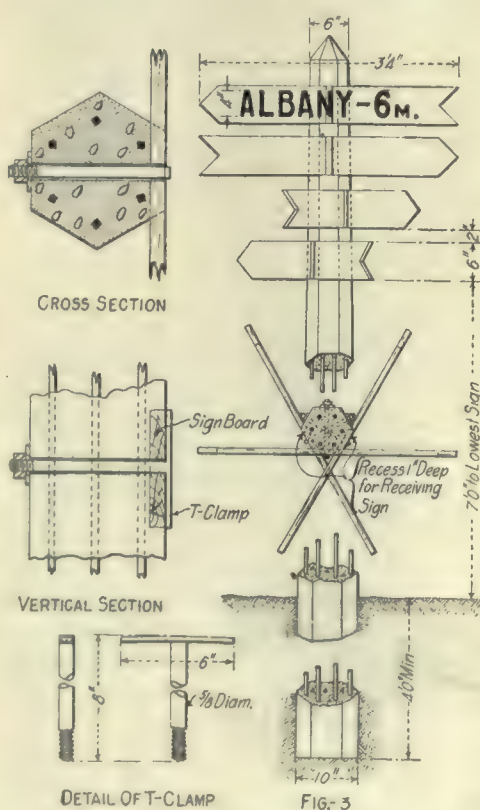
ALTERNATE TYPE OF CONCRETE POST IN NEW YORK
